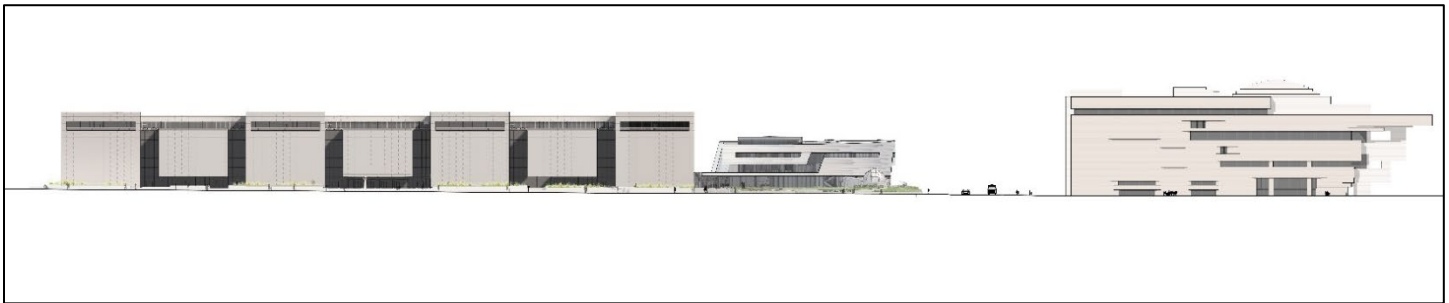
Proposed south elevation of the addition. Note the main mass of the new construction set back, and leaning away from the NASM, to allow the east elevation to remain visible and create a visual separation between the museum and the BLC. (Perkins&Will, 2024)
